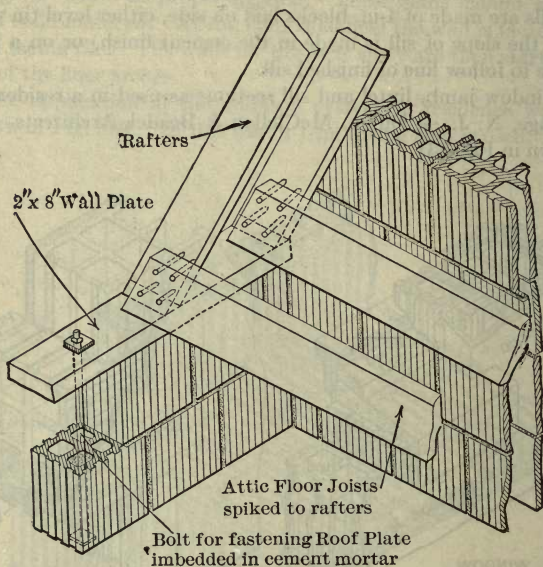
Wood Roof Construction on Hollow Tile Walls.
